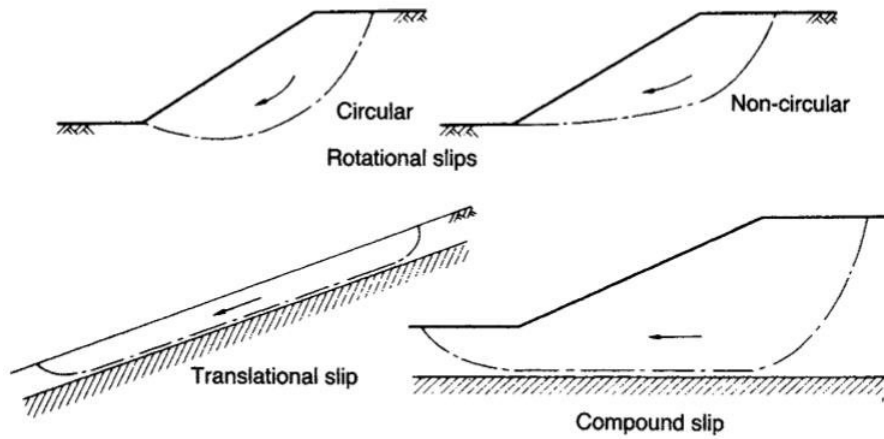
Slope failure mechanism (R.F.Craig, 1983)
